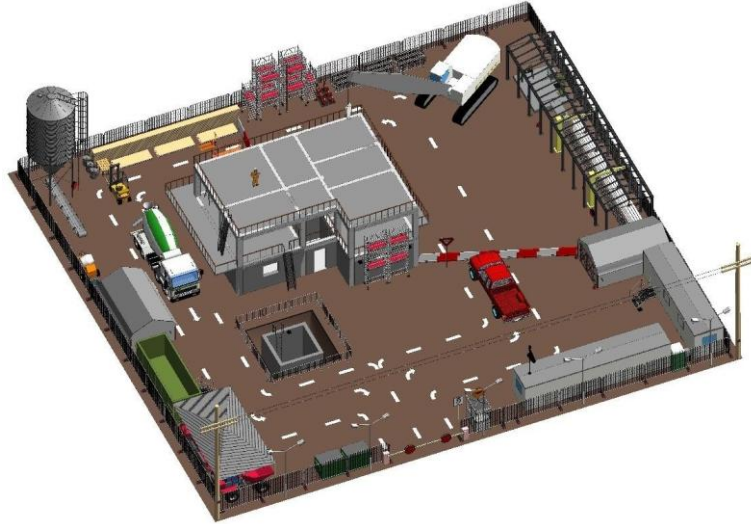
3D view of the construction site with the applied safety measures in a BIM form
